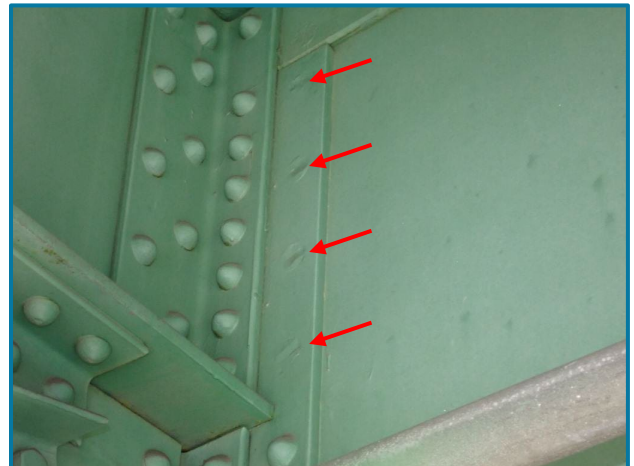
South Girder near FB 6 has 4 plug welds (Span 16 shown, looking southeast).
